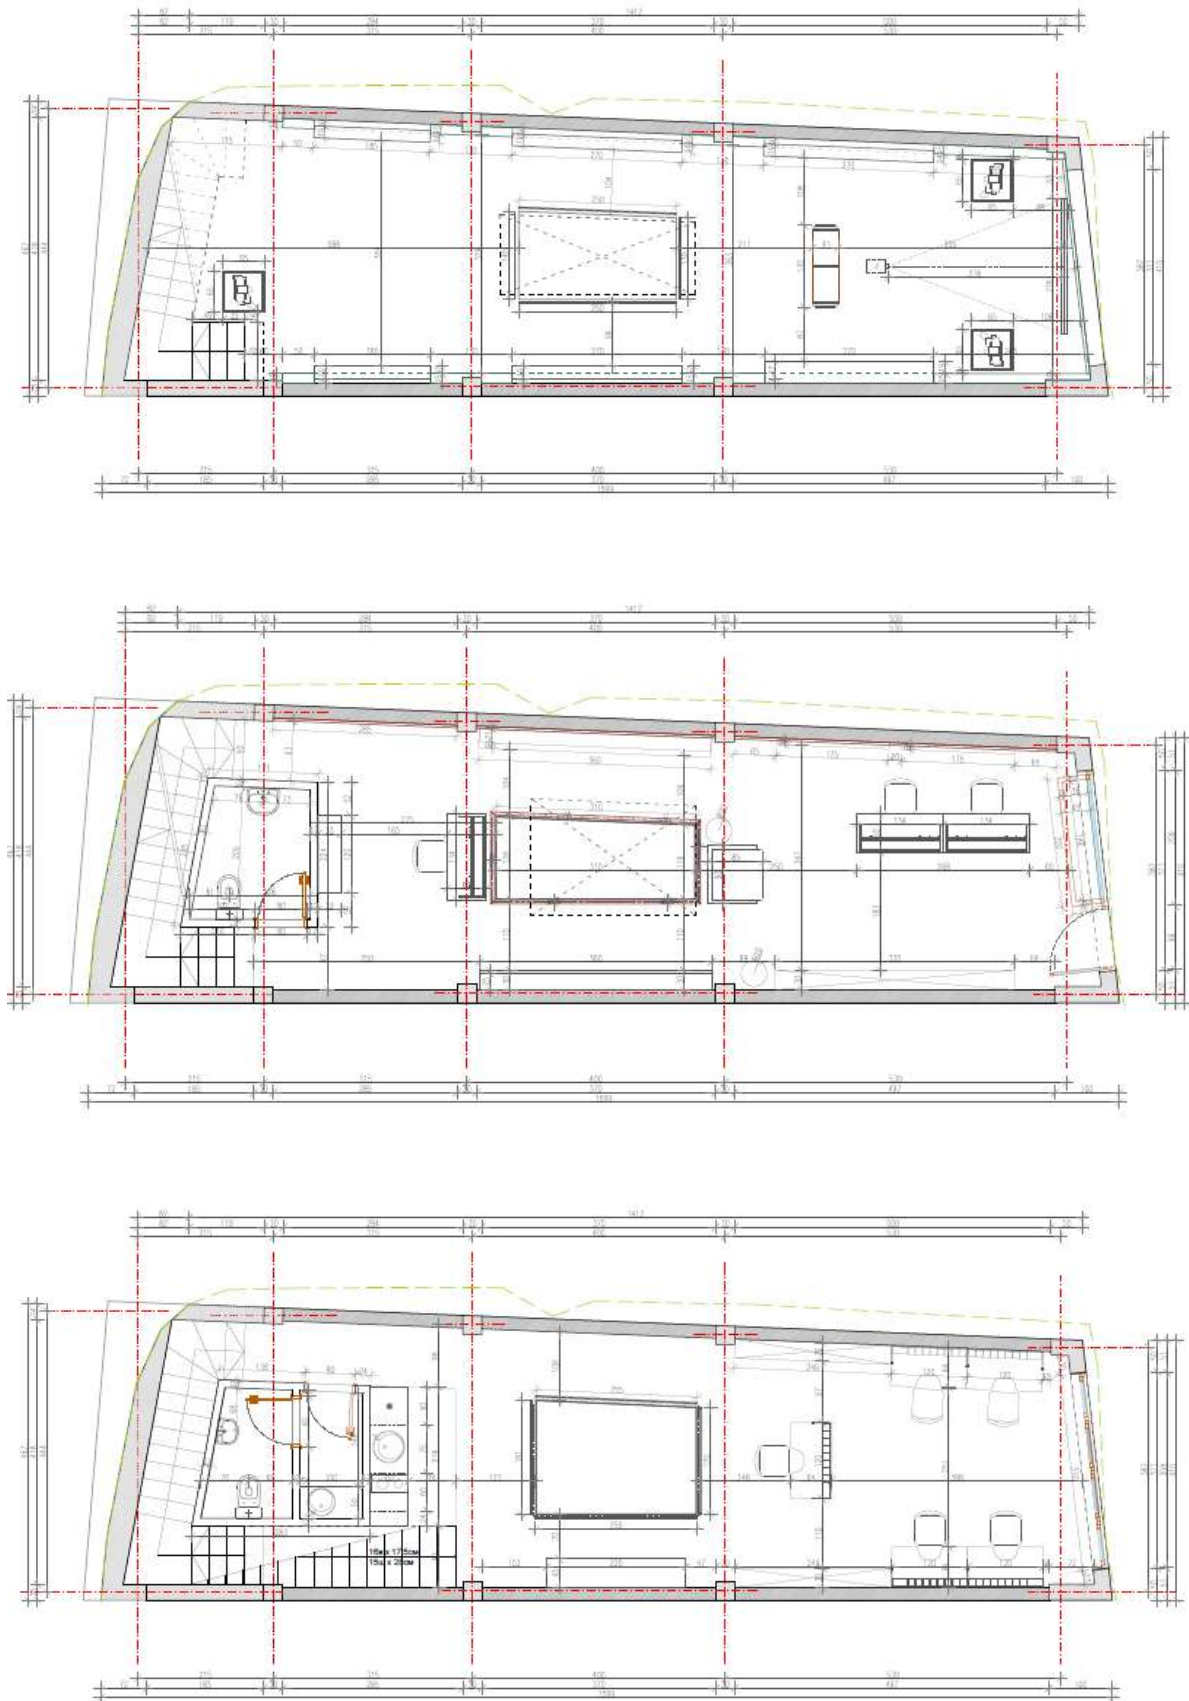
Situation of basement, ground floor and first floor according to new detail design (functional solution)
